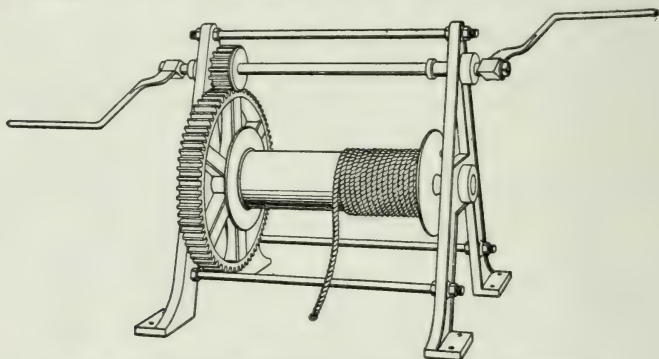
Windlass, with gearing, such as is used with a pile-driver.
